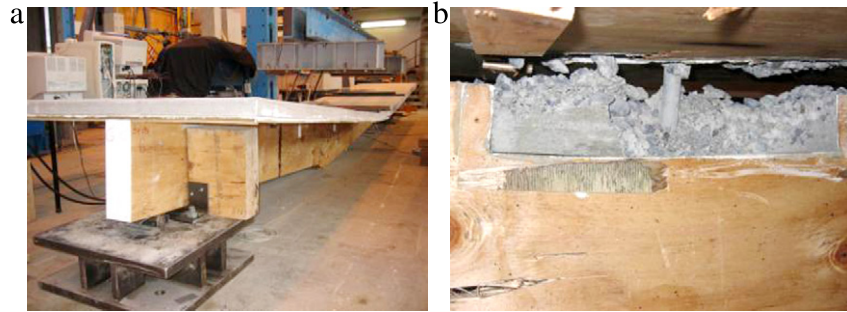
Different types of failure mechanisms detected in the composite beams: (a) fracture in tension of LVL; (b) failure for concrete shear and crushing in 300 mm rectangular notch coach connection.
